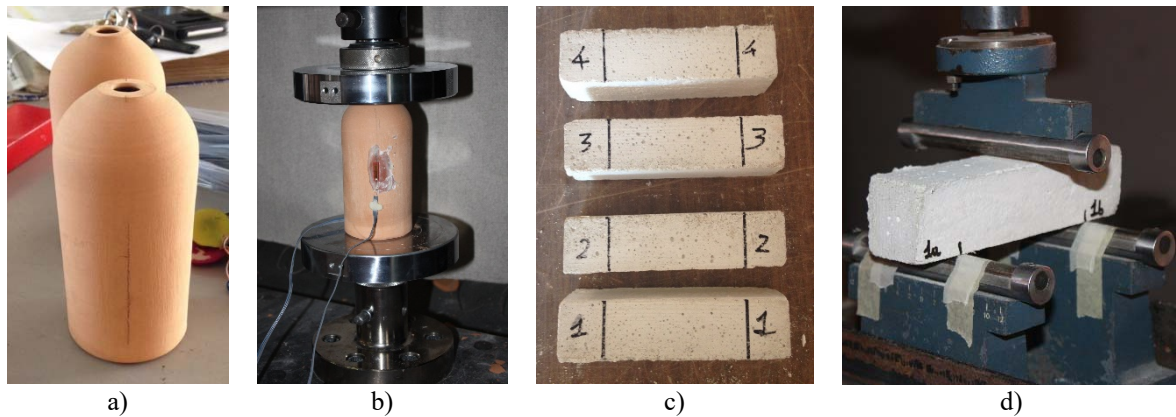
a) Carosello specimens; b) Set-up compression machine; c) Specimens of mortar; d) Set-up three points bending machine
